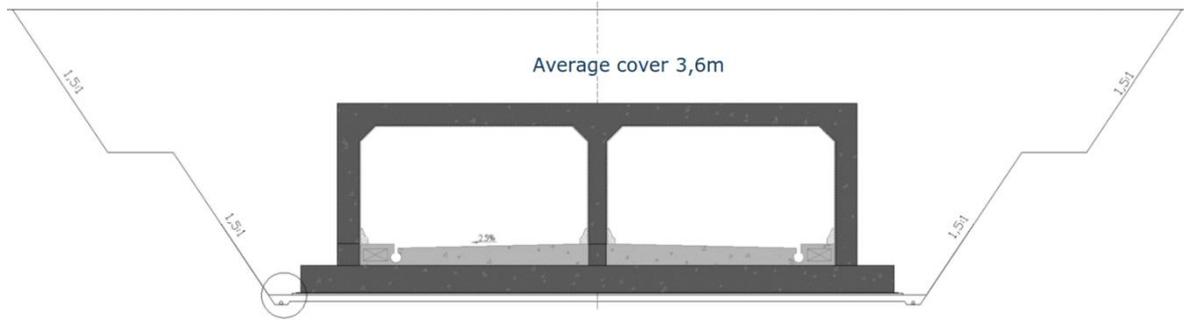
Typical Underpass Cross-Section including benched excavation slopes
